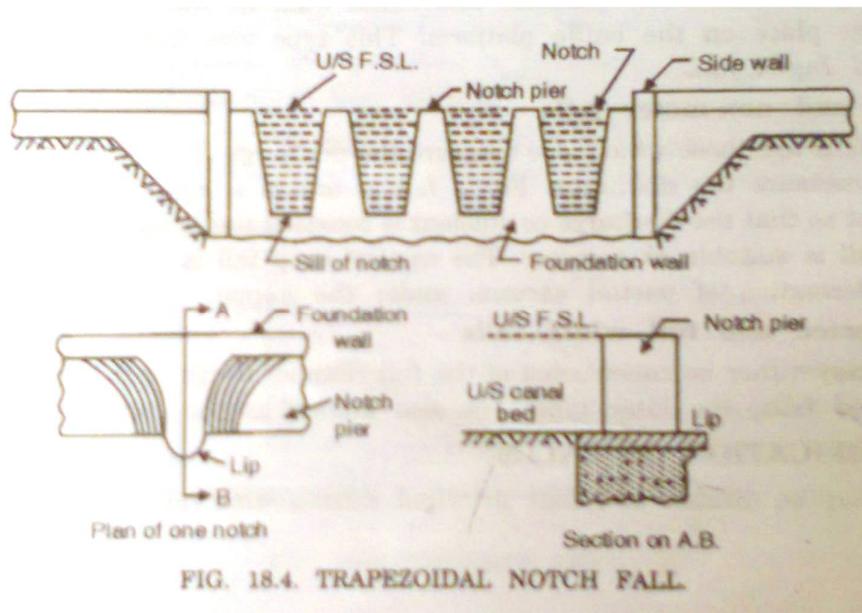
TRAPEZOIDAL NOTCH FALL.
